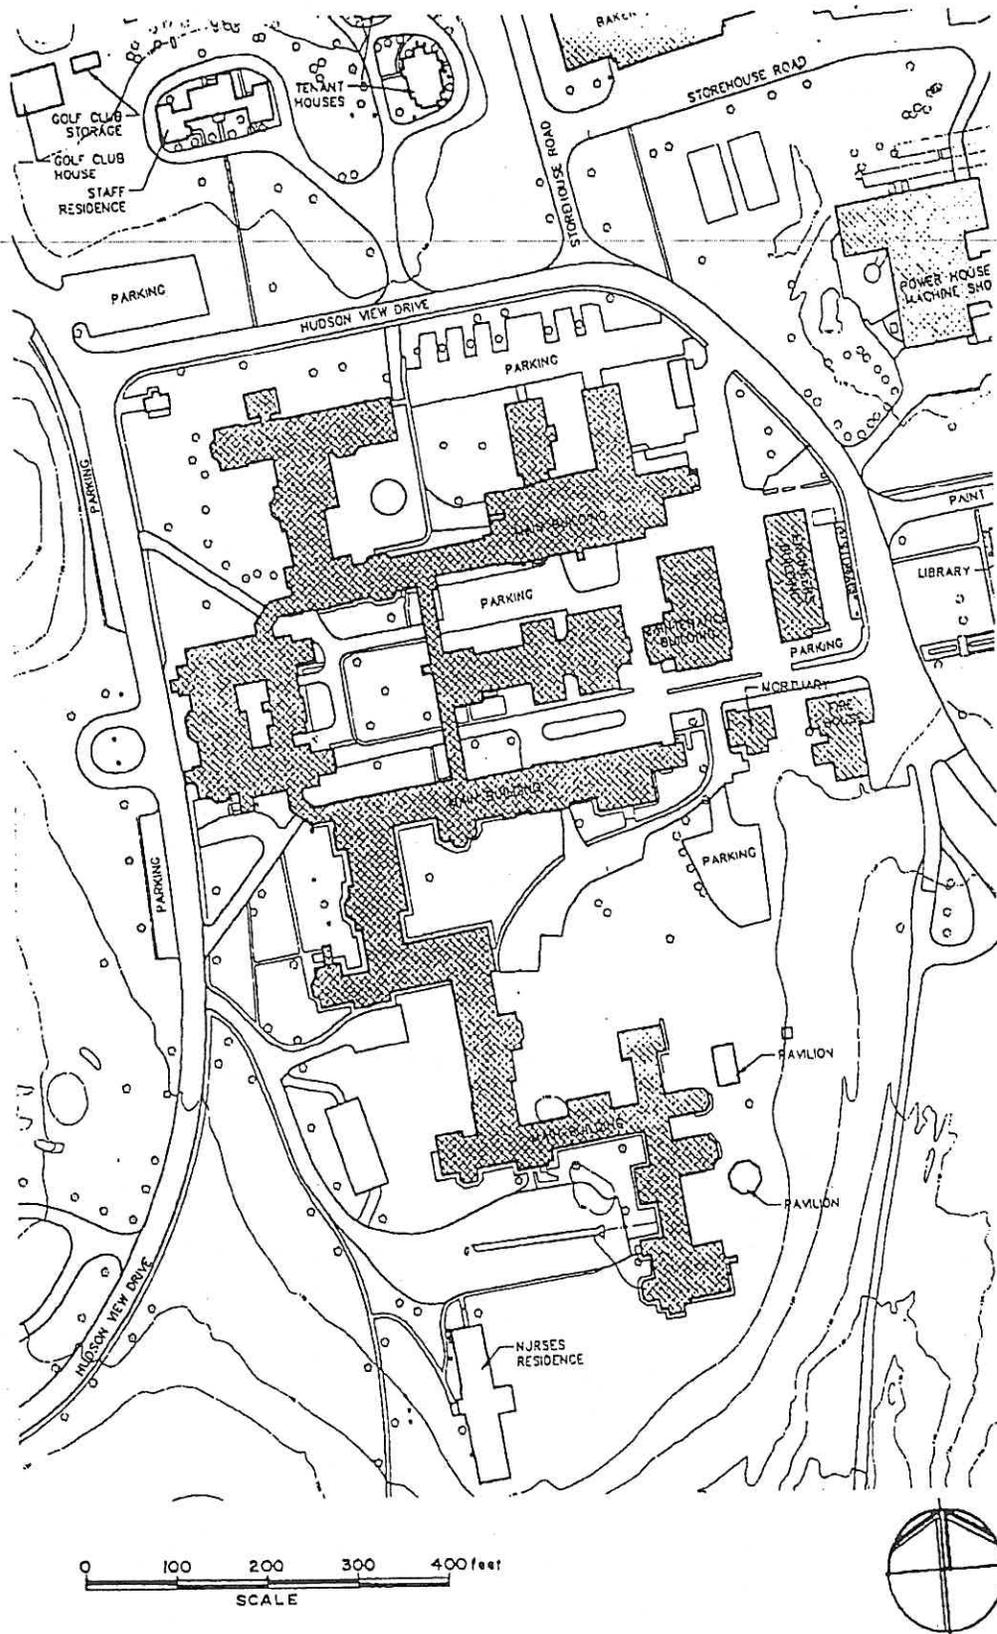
Plan of the Main Building and surroundings showing current conditions.
